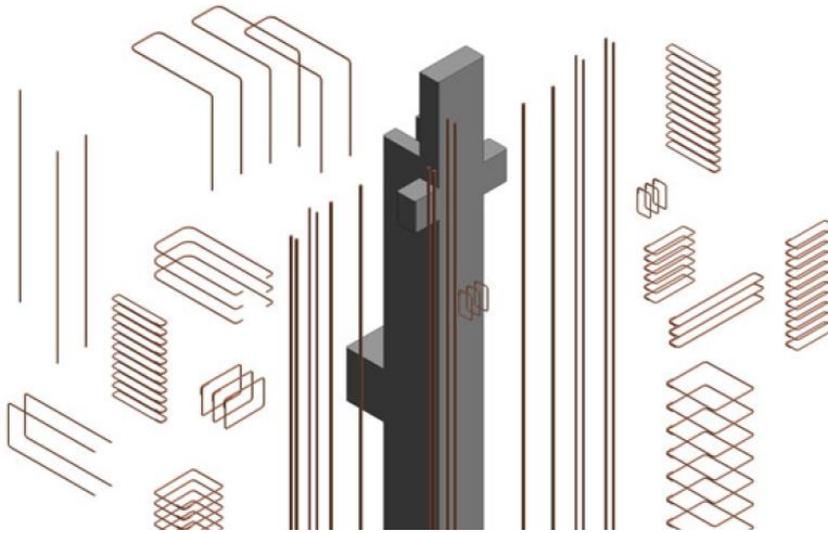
Exploded drawing of a reinforcement model for a column [12].
